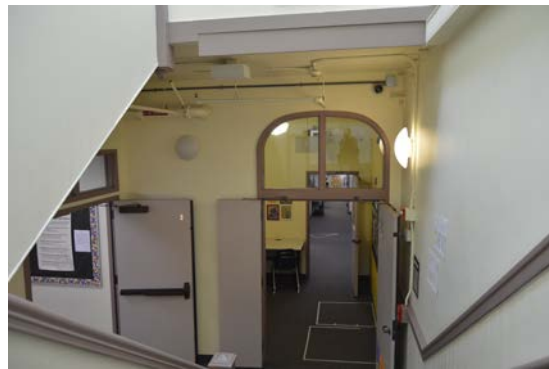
Divided-lite arched transom with wired glass. Looking south.
